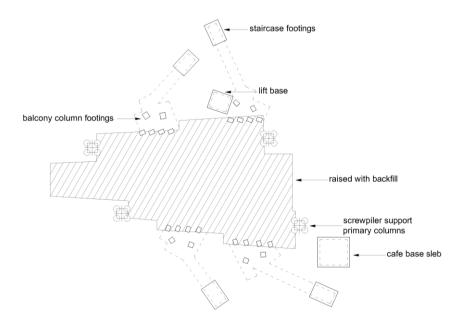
Detail Plan of the 2008 Serpentine Pavilion. Source: Plan scheme is produced by the author.
